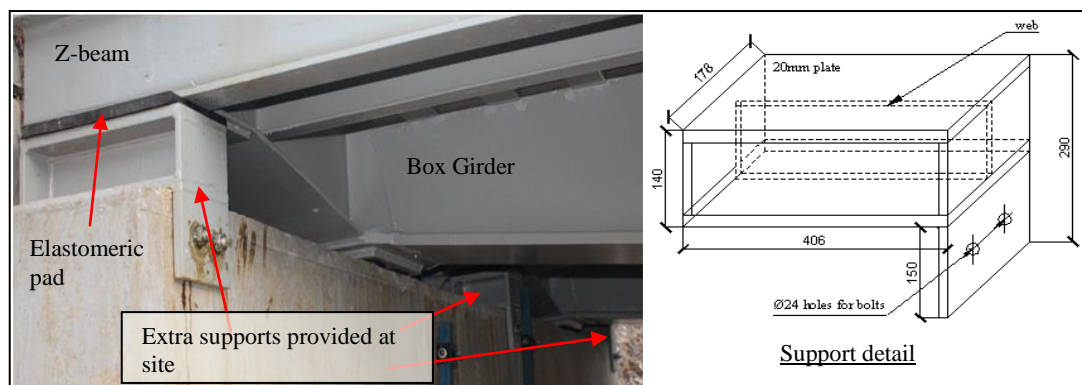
Extra supports supporting edged Z-beams and central connection bracket
